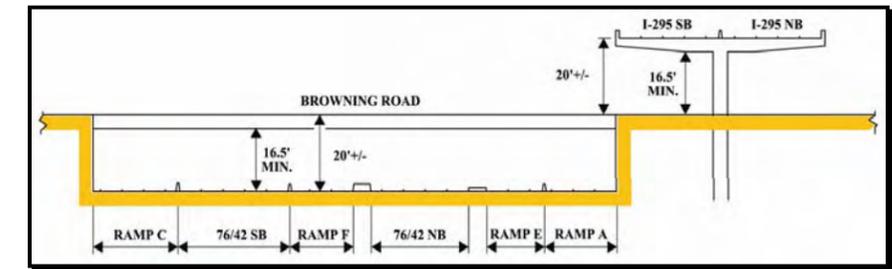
Section A-A at Browning Road (Alternative B1)
